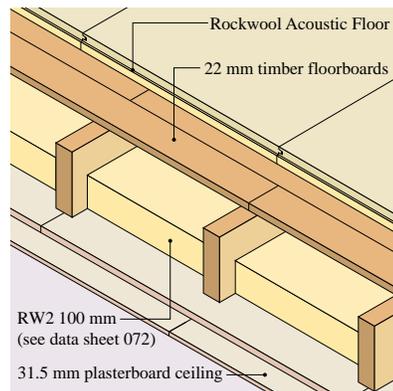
Timber joisted floor using Rockwool Acoustic Floor System
